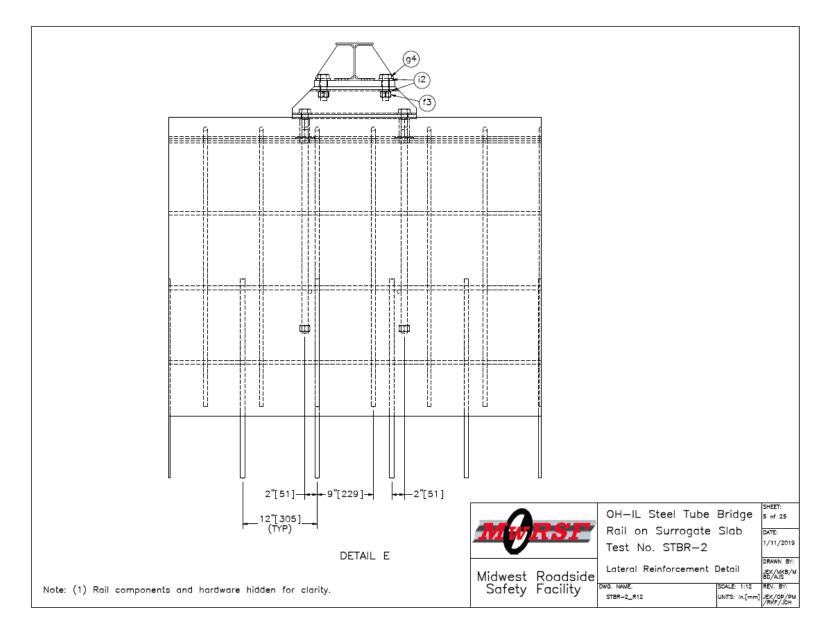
Lateral Reinforcement Detail, Test No. STBR-2
